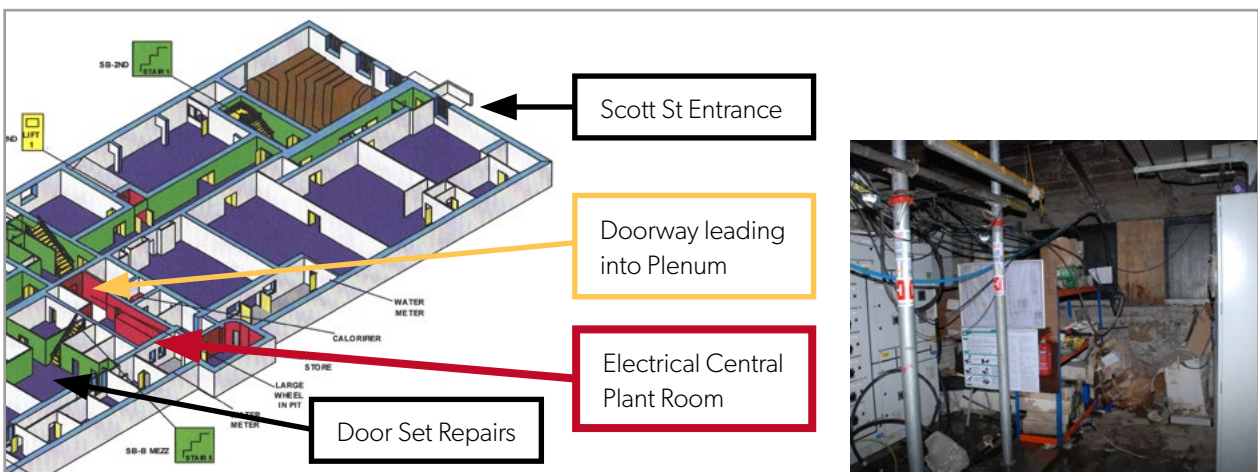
Level 2 location (and photograph) of Electrical Central Plant Room
